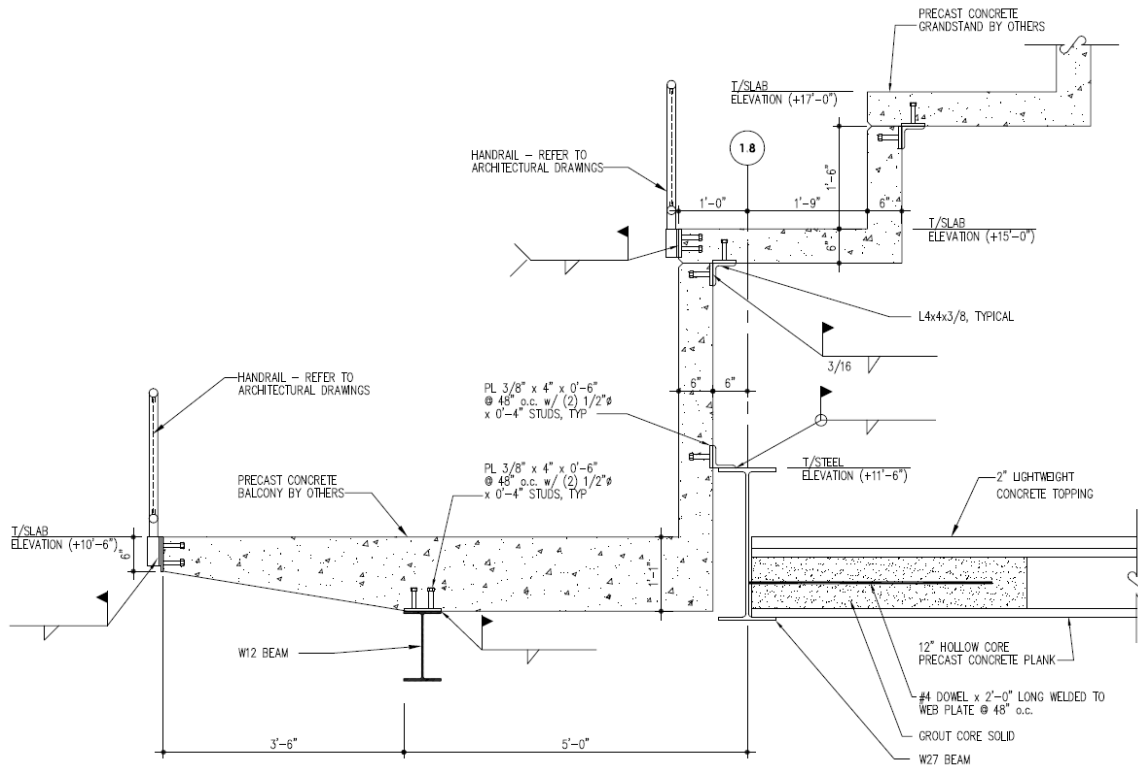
Section showing 12” hollow core precast concrete planks bearing on bottom flange of W27x84 girder
